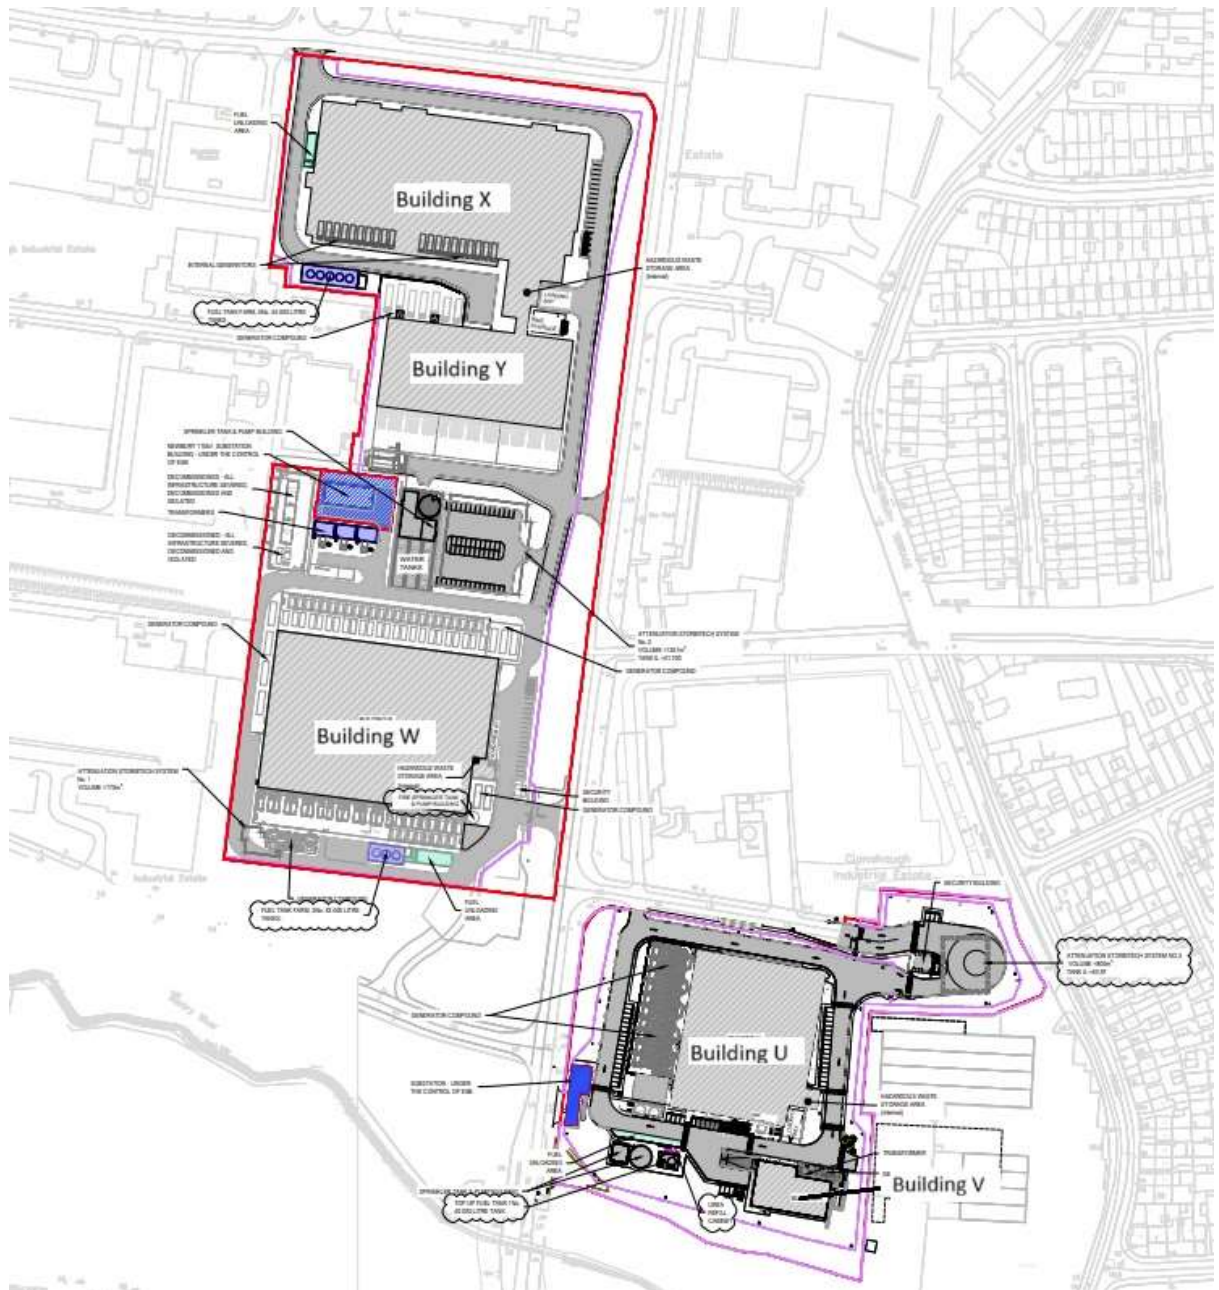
Site Layout (existing with extended Installation refer to Drawing 21_123F-CSE-00-XX-DR-C-0002 - Site Layout Plan
